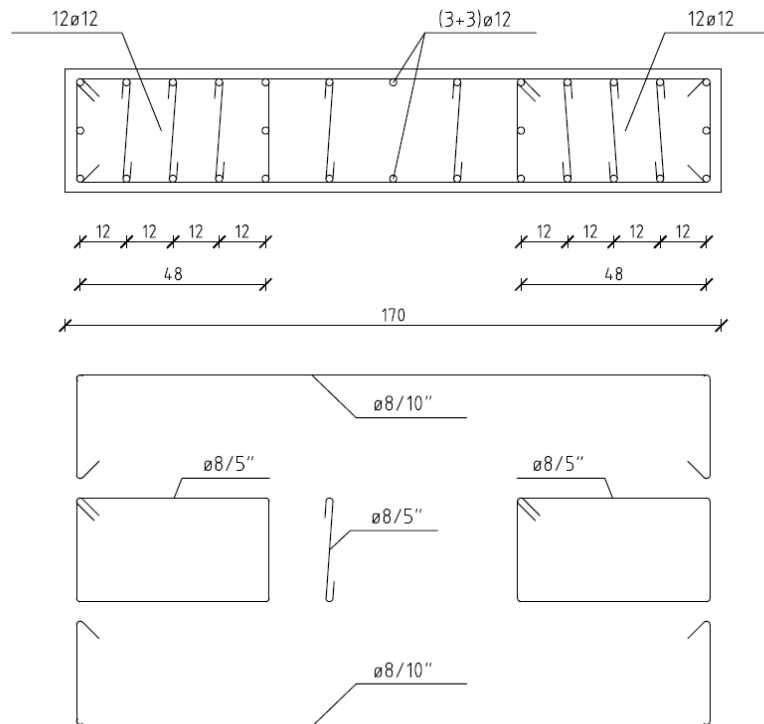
Vertical reinforcement of wall C1 and C3. Model III
